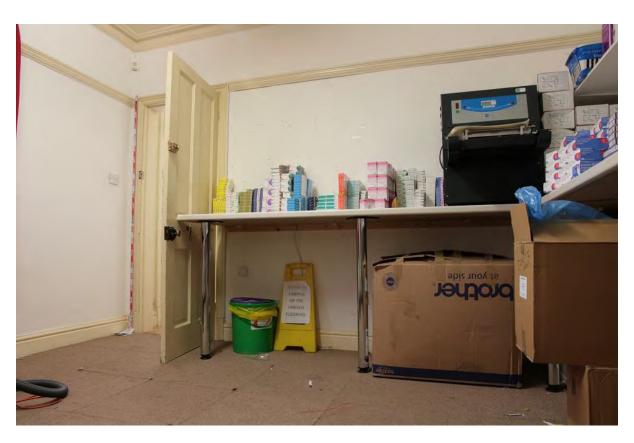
South-west wall of Staff/Store Area, looking south (LMSC16 D100 66))
